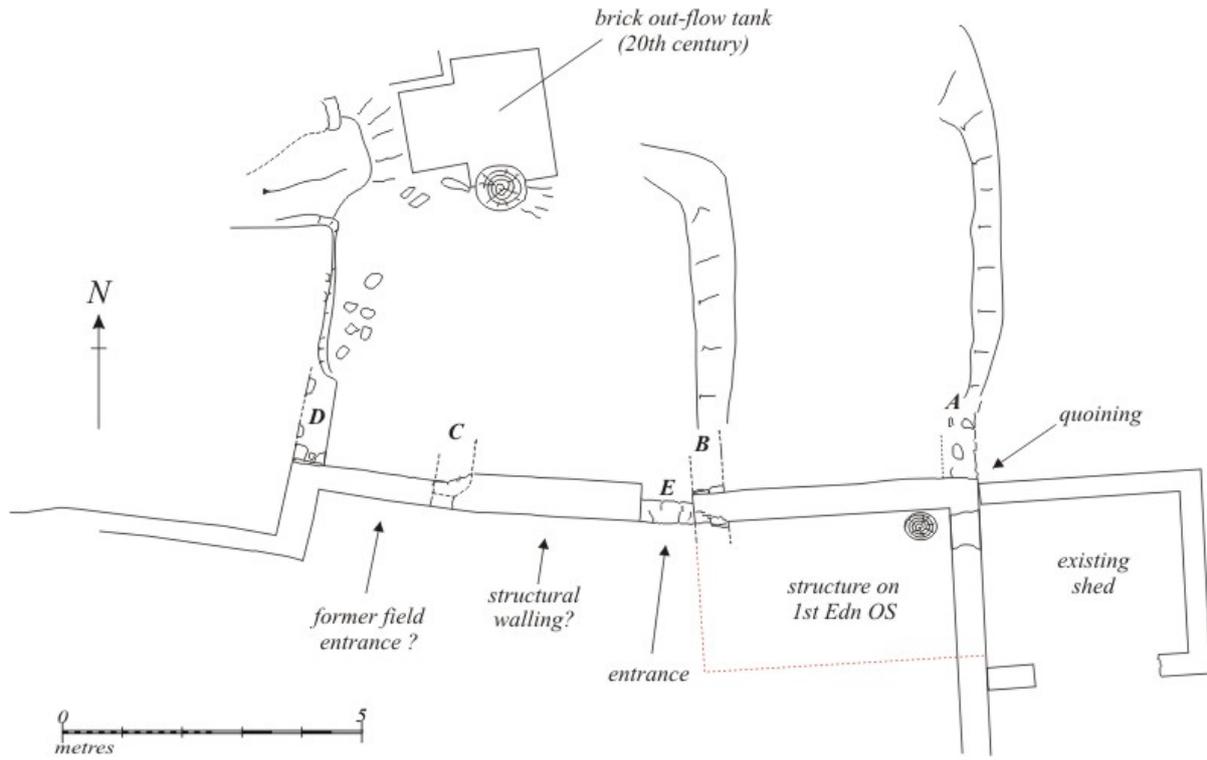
plan of the field wall bounding the north side of the farm access road
